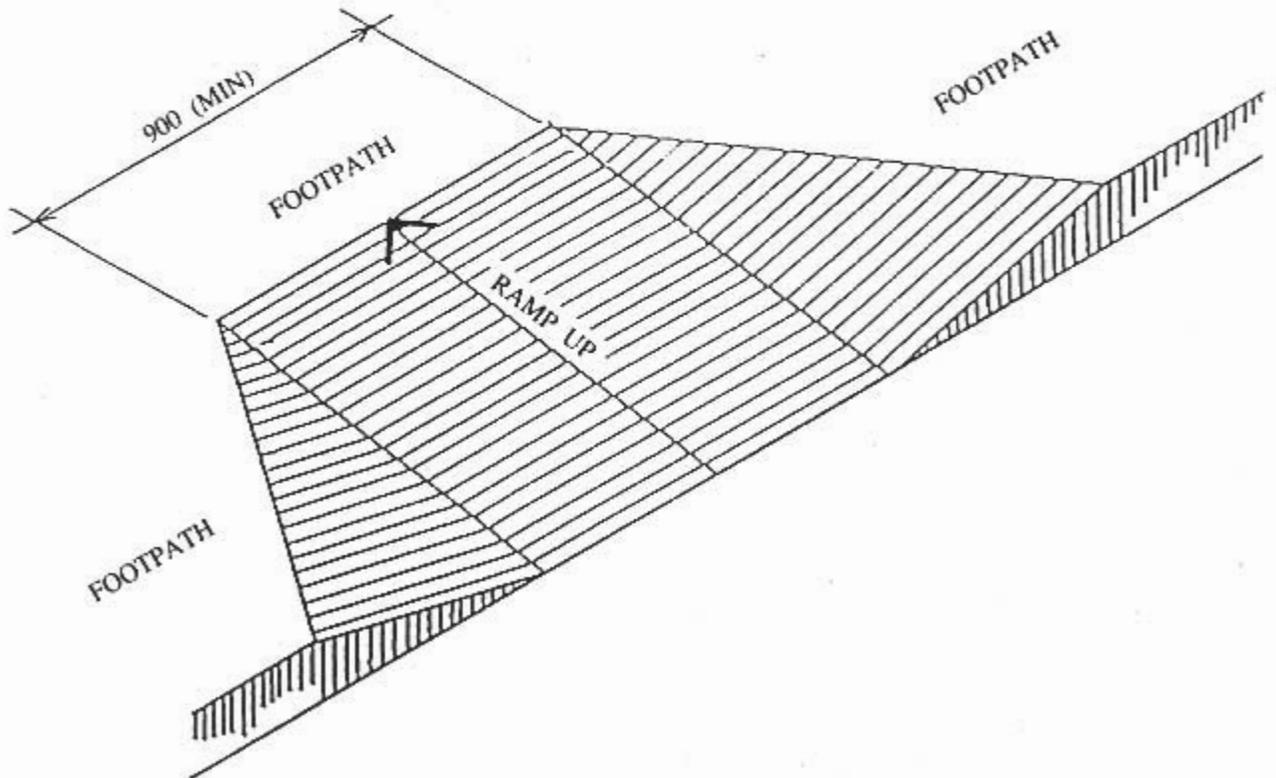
ISOMETRIC VIEW OF FLARED RAMP
